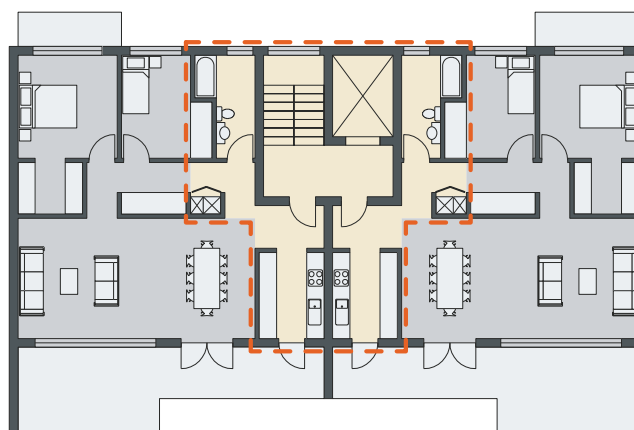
H.2 The building layout should ensure that amenity impacts from noise are reduced to both living areas and bedrooms. The plan above locates living spaces away from the noisy access core
